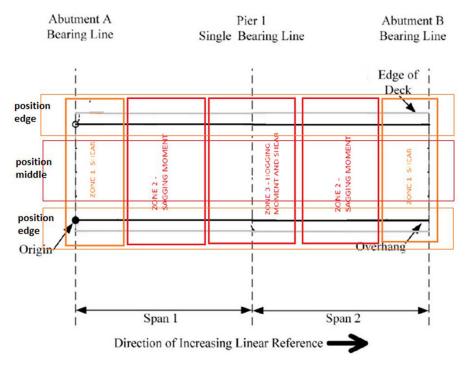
An example of segmentation for a two-span bridge, adapted from (LTBP, 2016)
